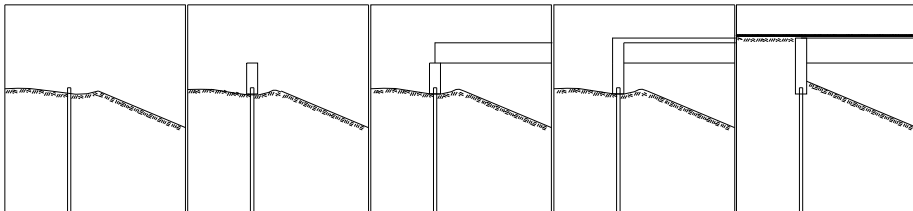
The sketches show the order in which a bridge with integral abutments should be built. First the piles are driven and the lower part of the abutment is cast. Then the beams are placed and the concrete slab is cast, beginning in mid-span. When the formwork is removed, the embankments can be filled and compacted at approximately the same rate at both abutments.
